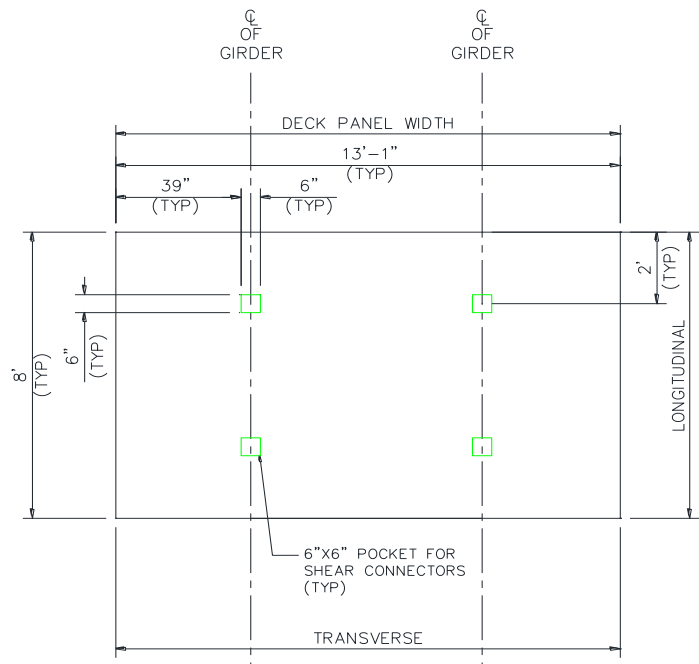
Typical Precast Deck Panel with Pockets for Shear Connectors
